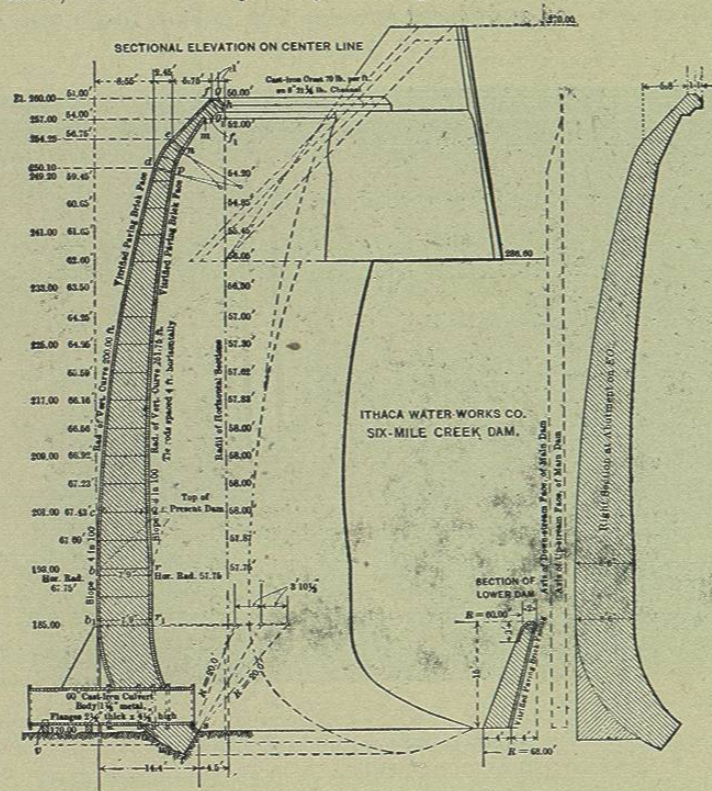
ITHACA CONCRETE-BRICK FACED DAM. SECTIONS OF DAM AS PLANNED.
